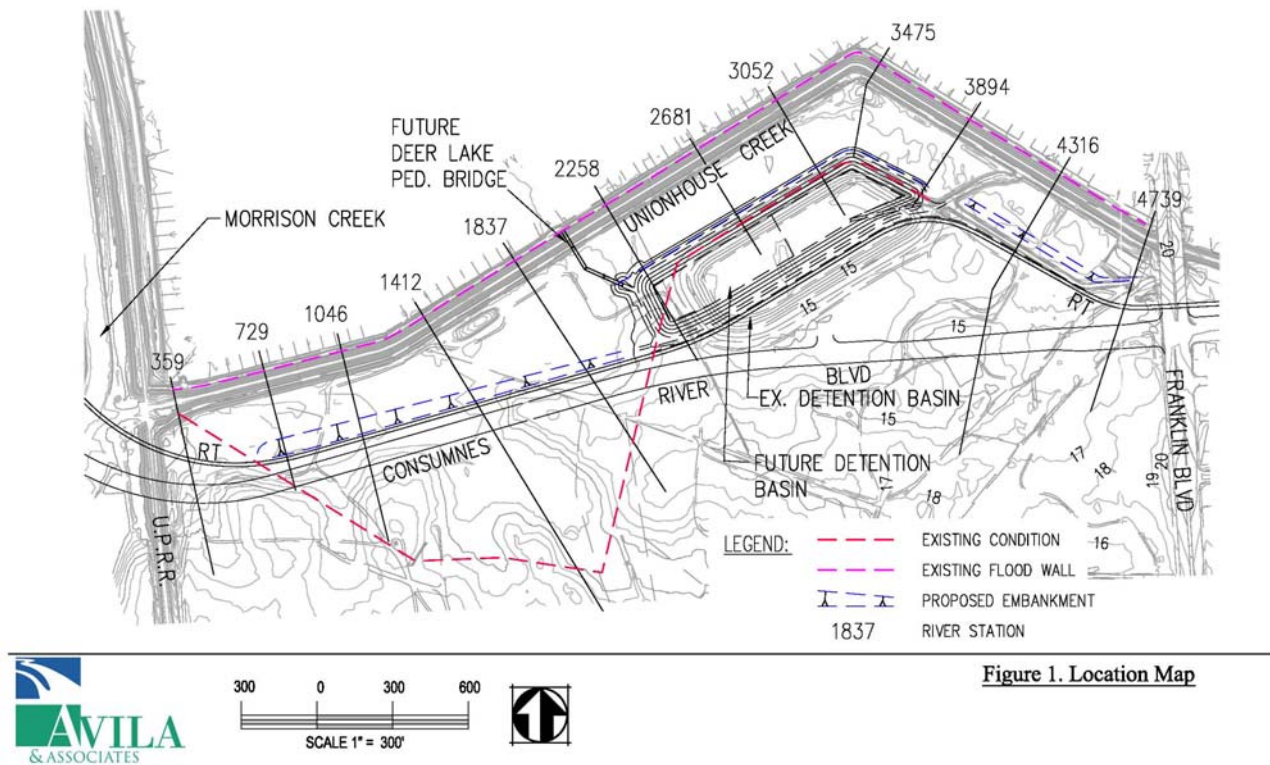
Plan view of HEC-RAS Cross sections for UPRR to Franklin Blvd
